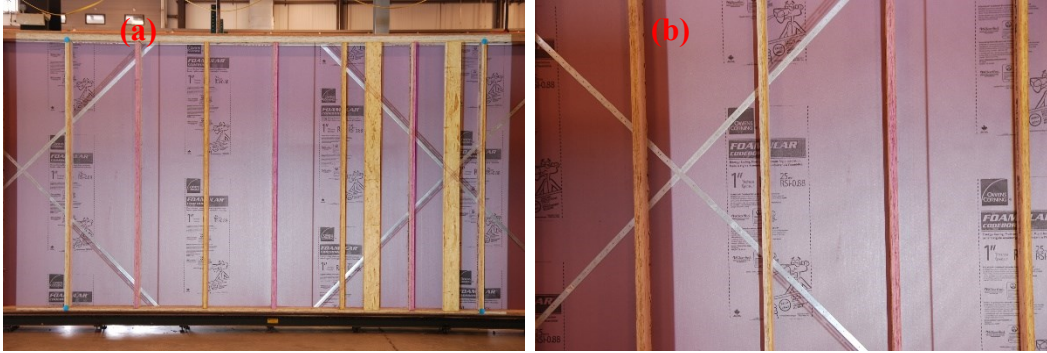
Projection of 2D assembly drawing on the panel: (a) zoom out view; (b) zoom in view
